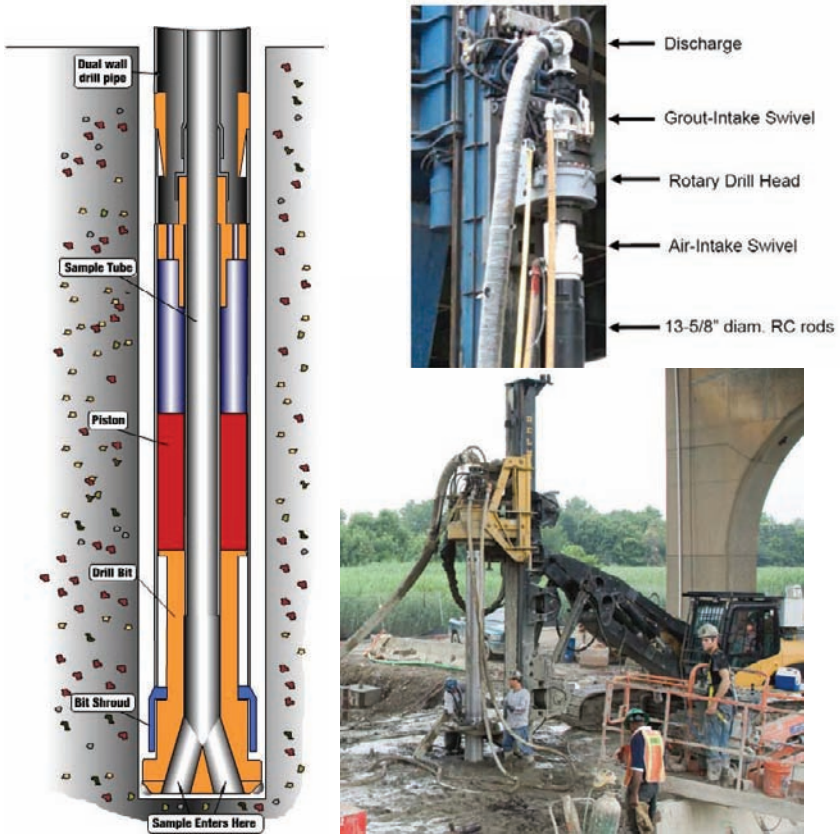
Hammer Grout Piles at the Bronx Whitestone Bridge.
